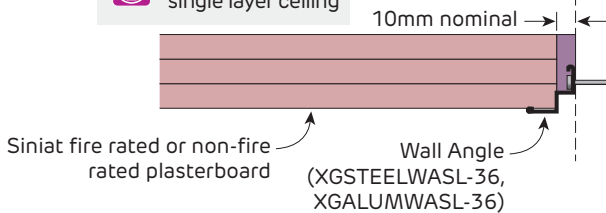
Finishing Detail - Shadowline Wall Angle Section
